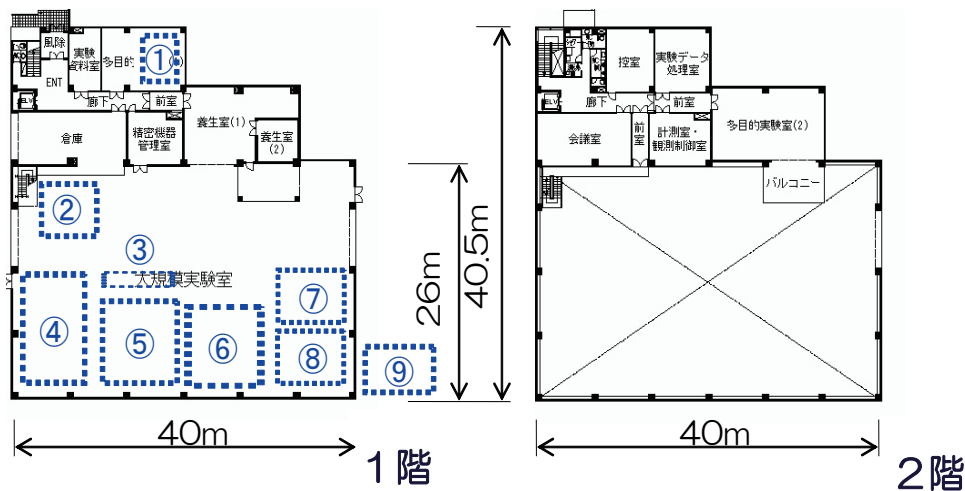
Floor plans and facilities/equipment of the Fire Research and Test Laboratory.
